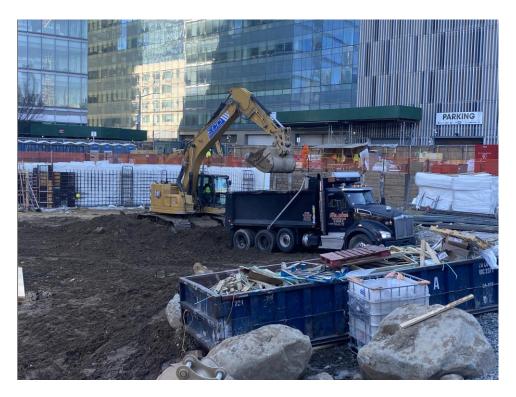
ECD loading trucks with non-hazardous fill from the stockpile in the southeastern part of the site (facing southeast)
